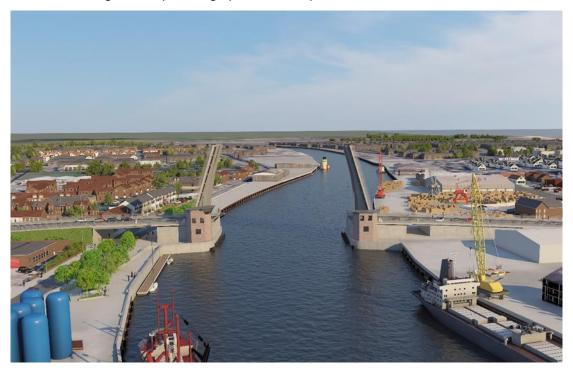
Proposed Bascule Bridge 3D Visualisation
